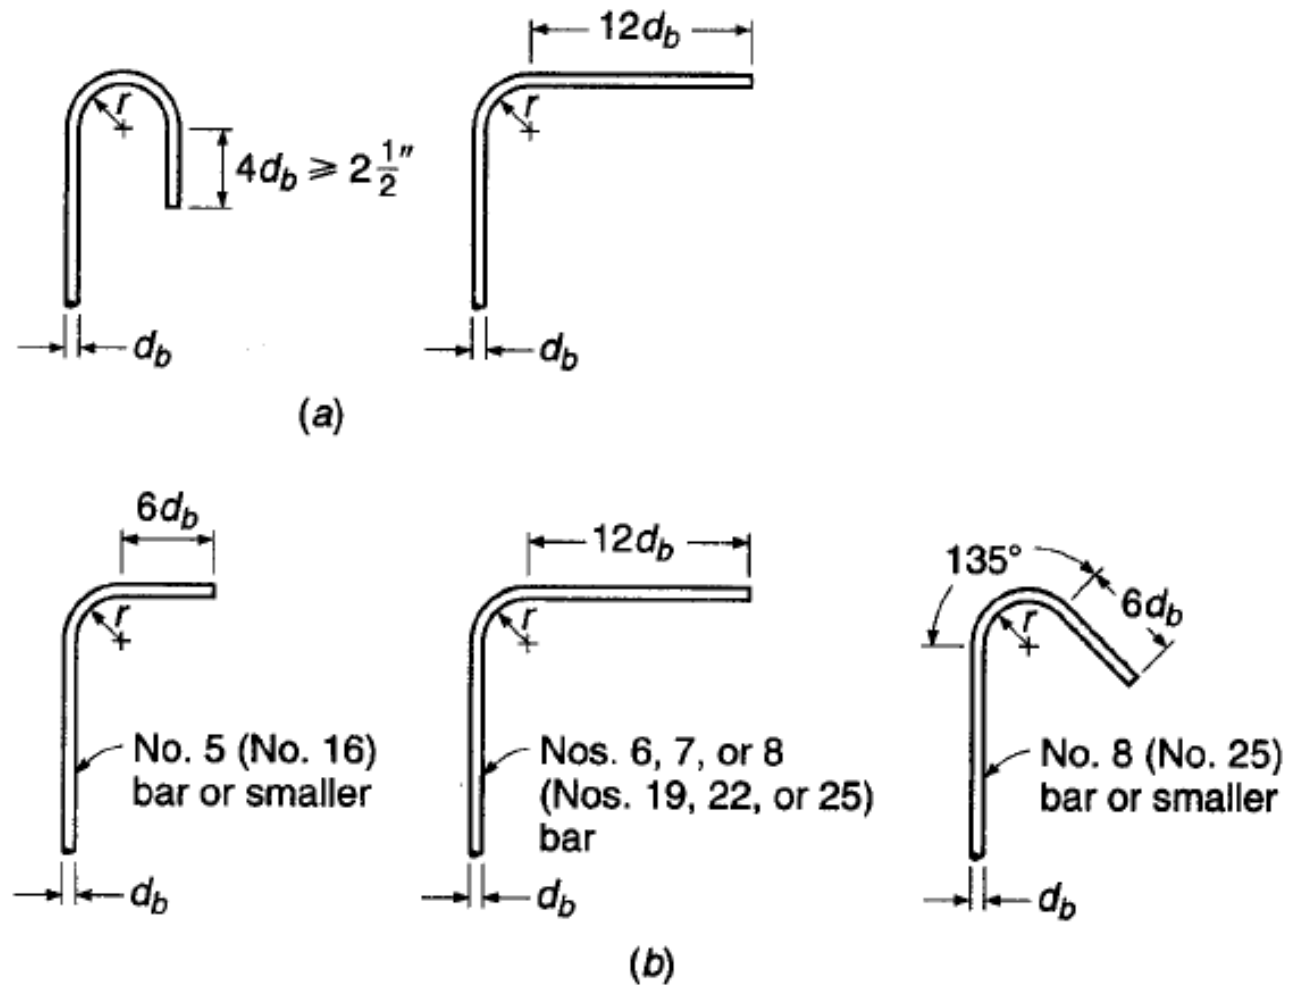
Standard bar Hooks: (a) Main reinforcement (b) stirrups and ties
